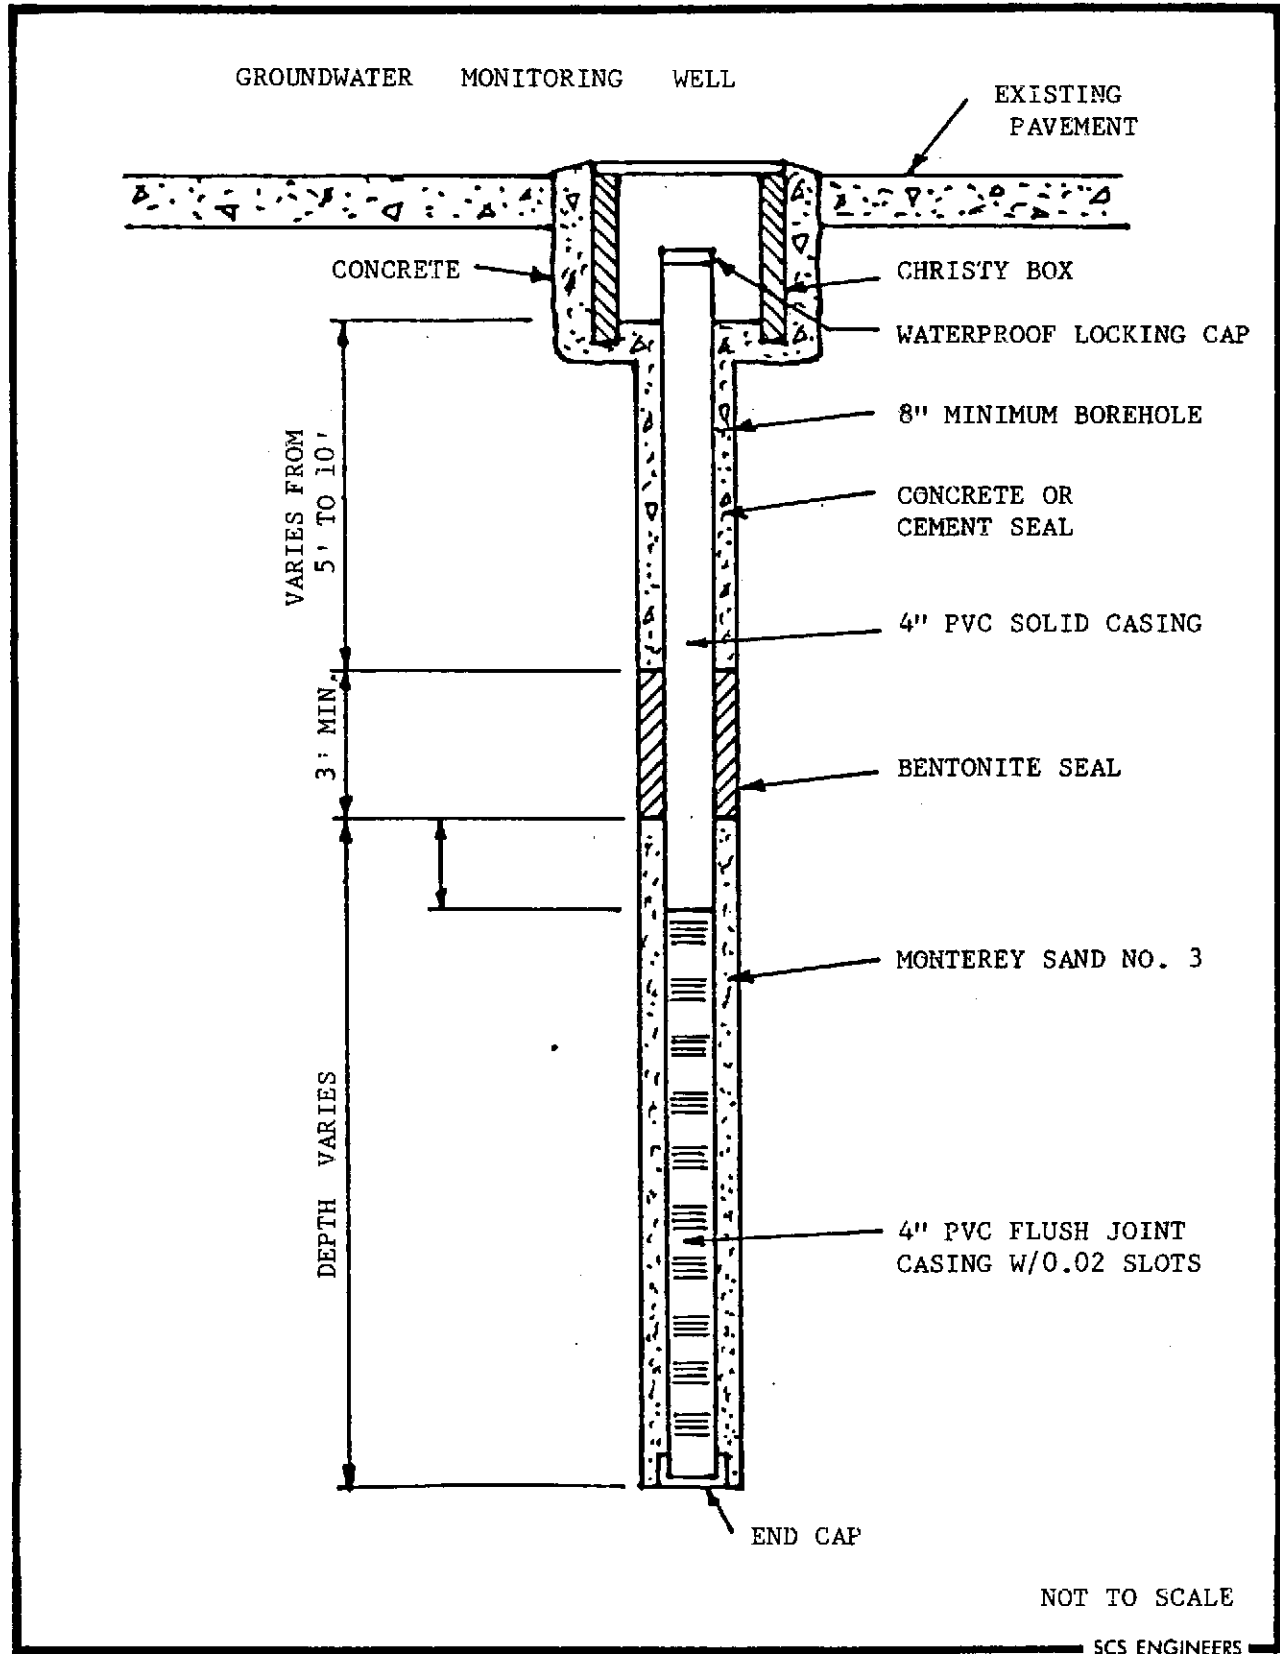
Typical Well Construction Details for the Installation of Groundwater Monitoring Wells
